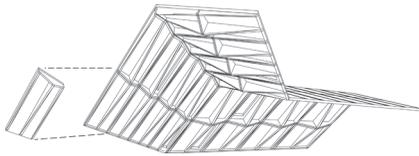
Drawing of a pitched roof made up of 32 individualized concrete elements.
